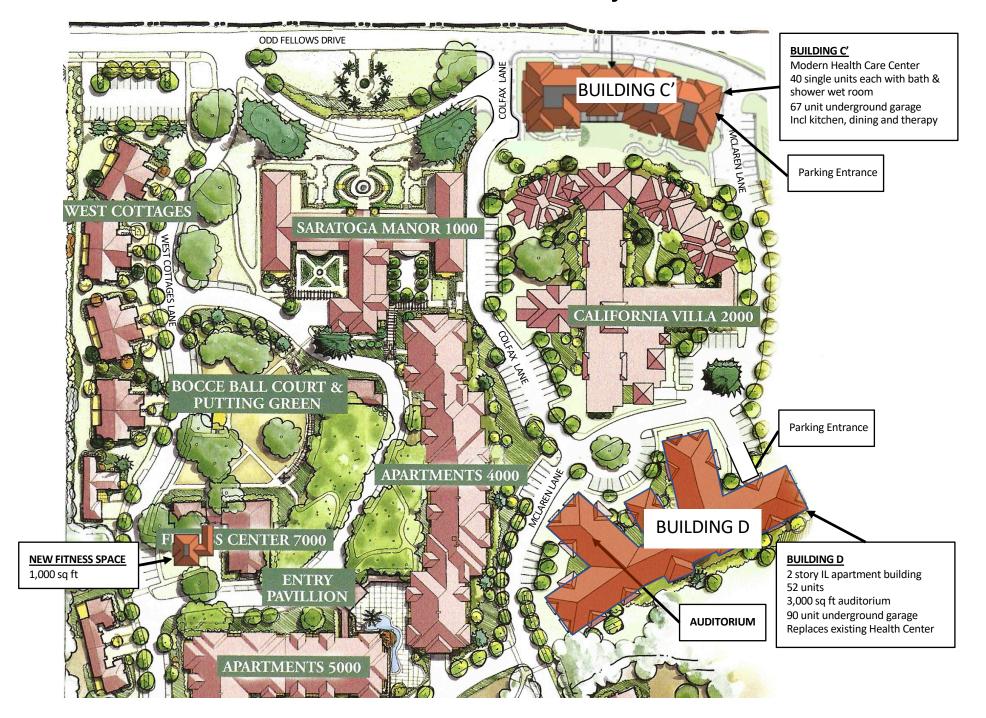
# Exhibit B: PRS Proposal Site Plan and Buildings of Particular Concern
